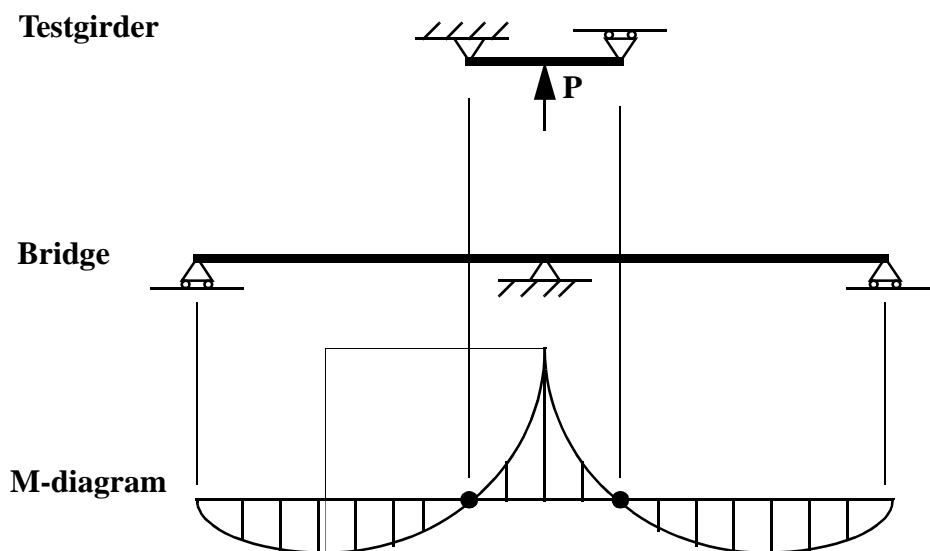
Testgirders simulating girder of a bridge at interior support
